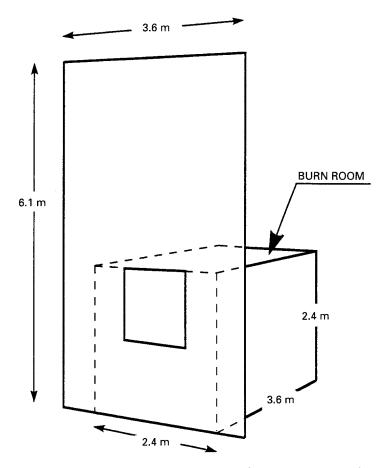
Smaller burn facility used to study fire exposure to exterior wall.
